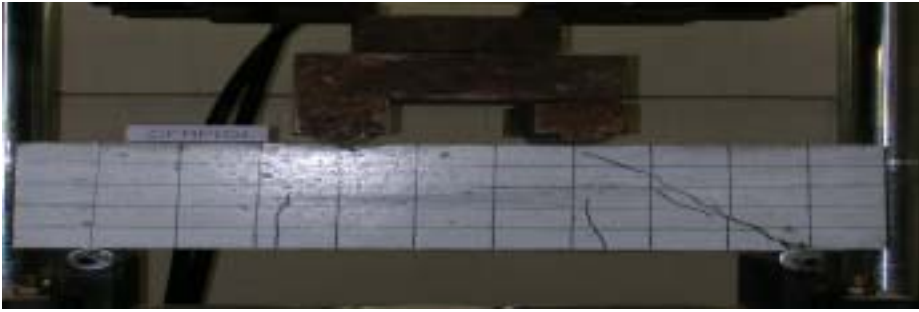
Photo of flexure and shear cracks from CFRP(D) rebar reinforced concrete specimens
